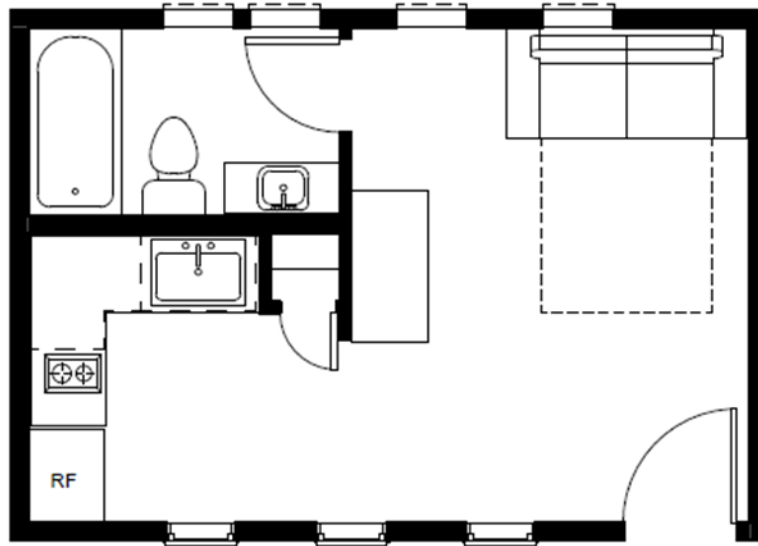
14'x20' floor plan that shows kitchen, bath, and fold-out bed.
